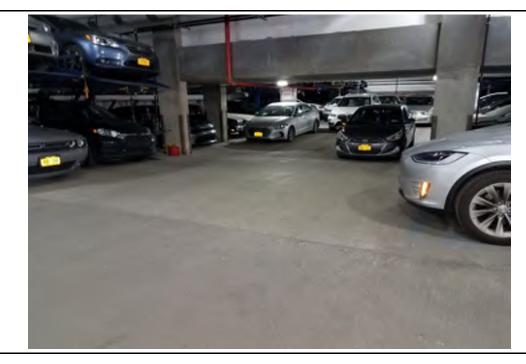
Subgrade parking garage concrete slab, facing southeast. 27 February 2019.
